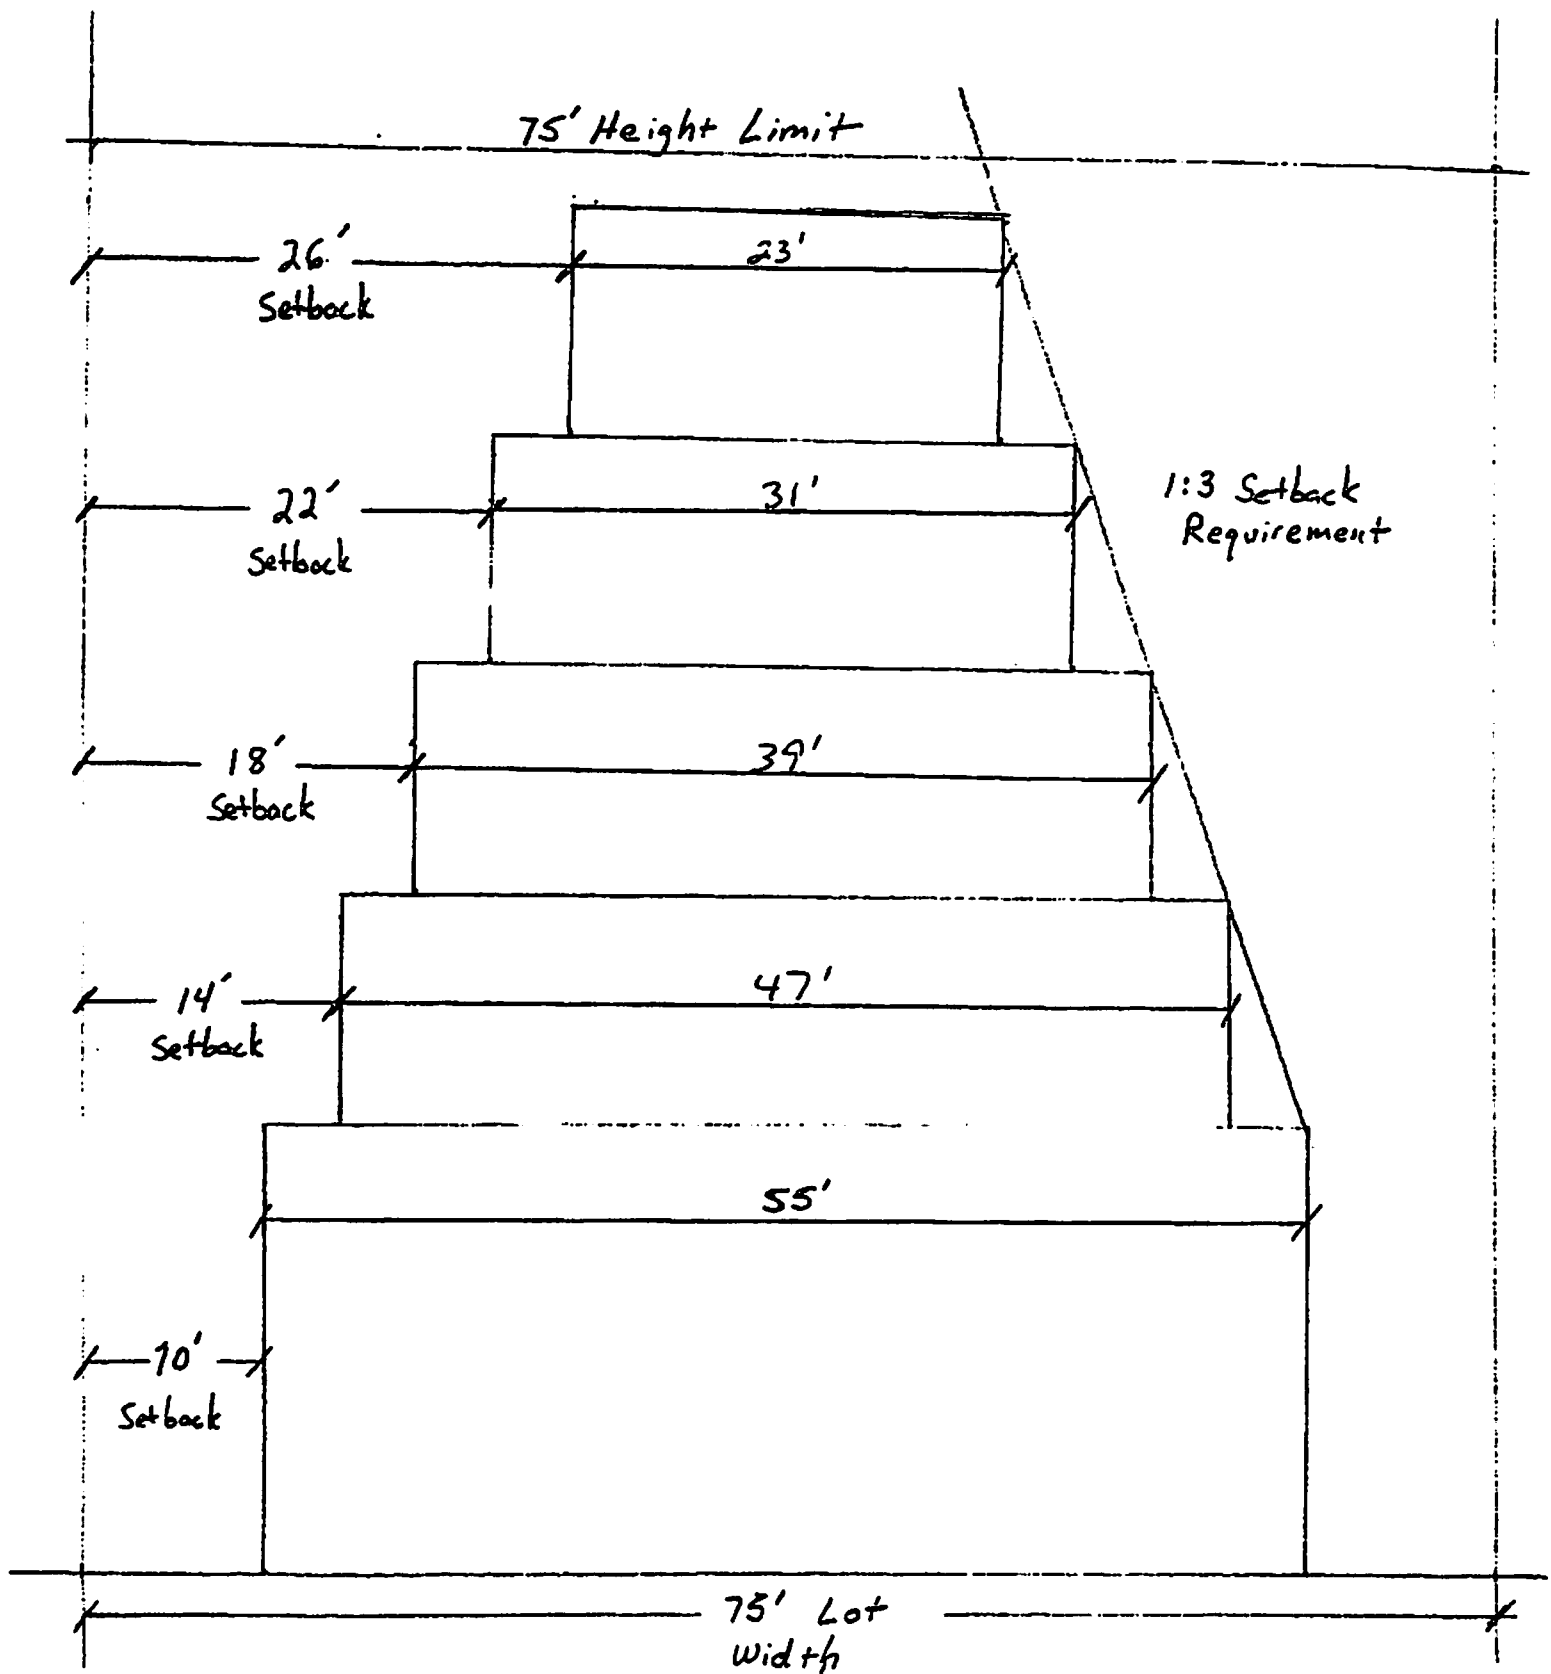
PREFERRED SECTION, INTERIOR ROAD, 3-5 STORY BUILDINGS, CURRENT SETBACK
